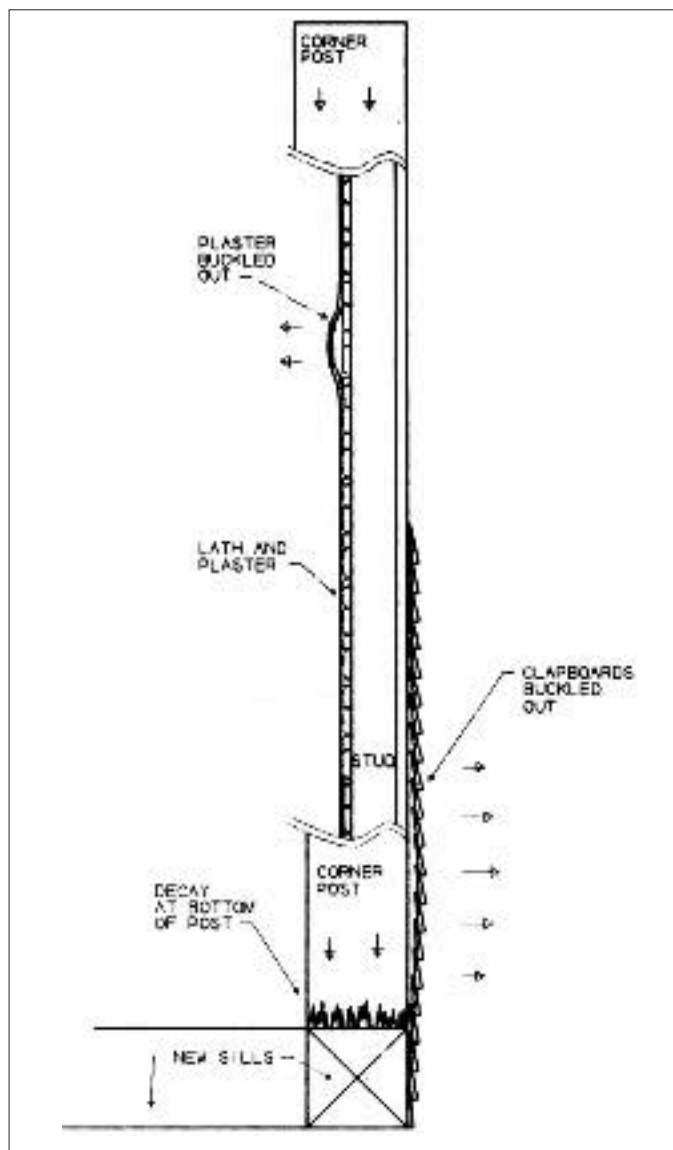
As the corner post dropped due to a decayed bottom, the added weight compressed the plaster and clapboards. Since the sills and studs remained stationary, the outer skins of the wall buckled and separated from the wall. While the damage to the plaster is not severe, it indicates serious structural damage below.
